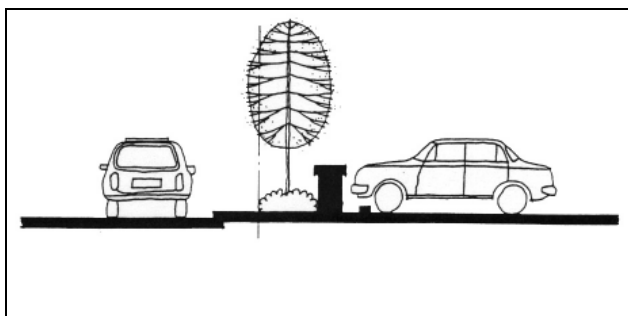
Walls and plantings along parking lots at street edge help reduce the visual impact of parking lots from the street.
